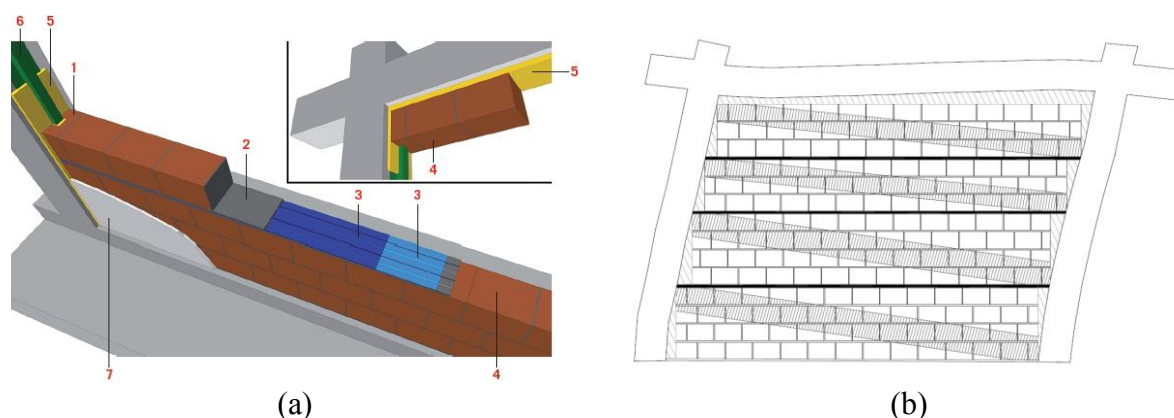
(a) Details of the innovative masonry infill with sliding joints: 1. C-shape units; 2. mortar bed-joints; 3. Sliding joints; 4. clay units; 5. interface joints; 6. shear keys; 7. Plaster. (b) Sketch of the compressive struts and the deformed frame with the infill with sliding joints
